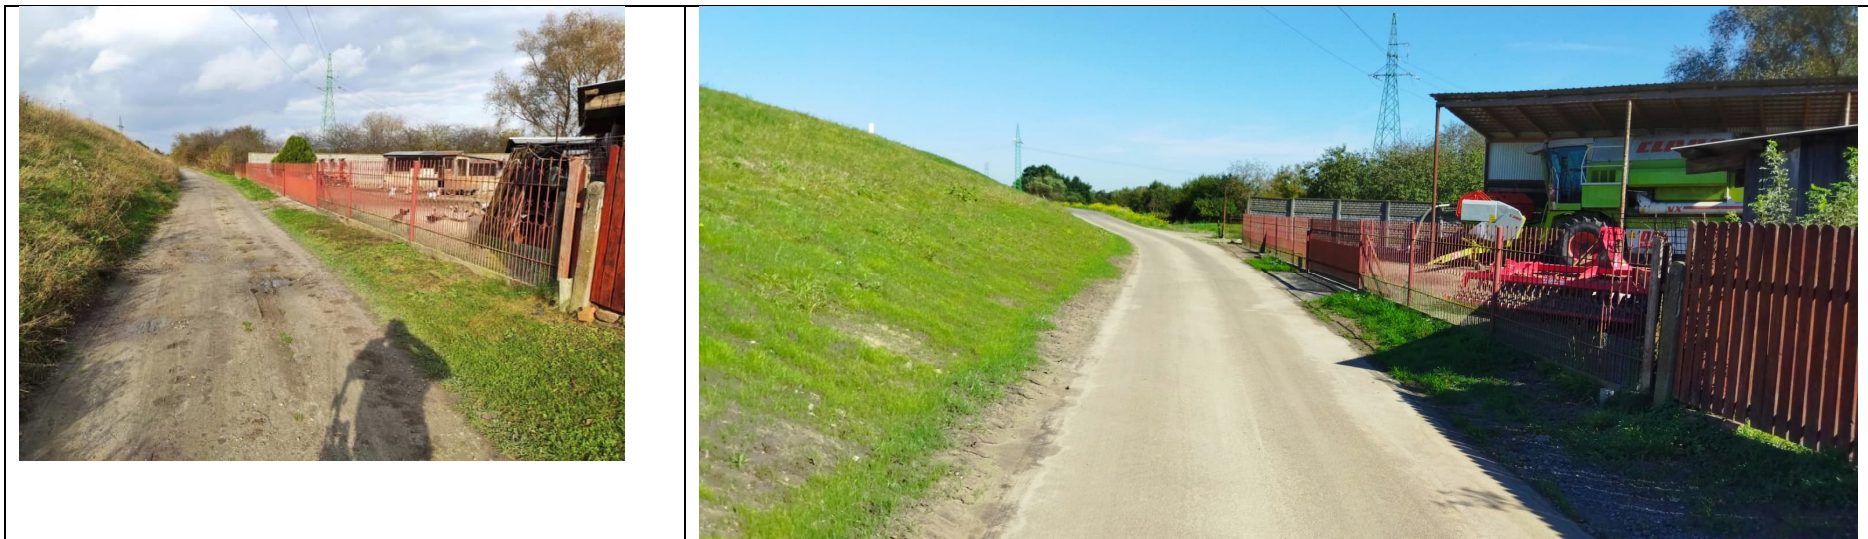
Road by right embankment, fences to be reconstructed, HV network pole in the distance.
